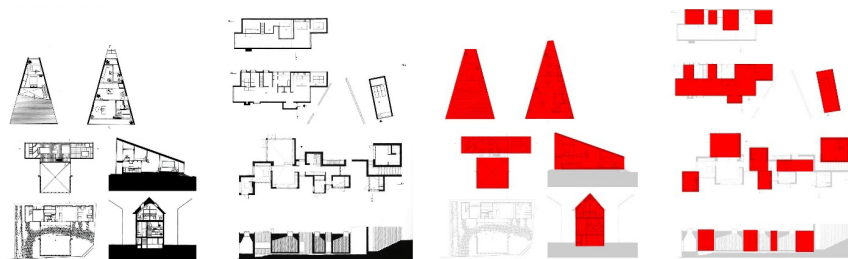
Floor plans and elevations in the Casa da Arquitectura archive. Source: Author's work on various images collected.
